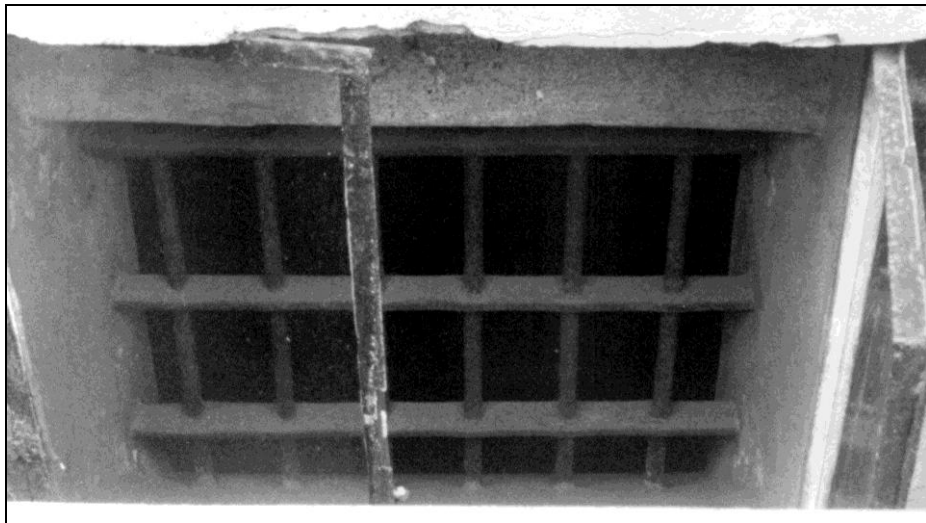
Block 11, outside, wall facing SSW, window of one of the bunker cells surrounded by a concrete screen.
